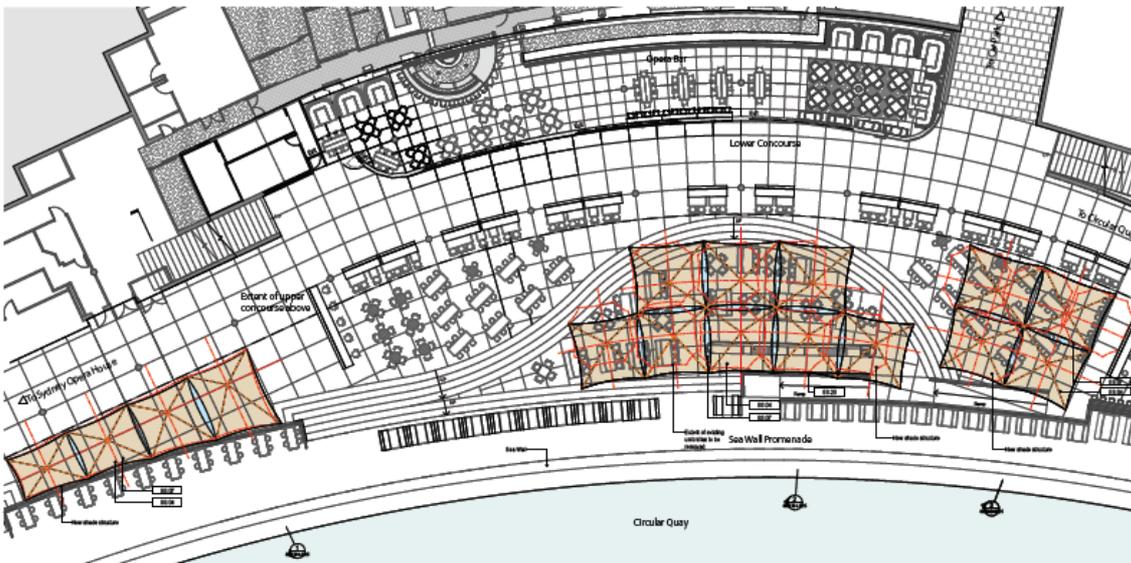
Plan view of proposed shade cover improvements (Source: H&E Architects)
